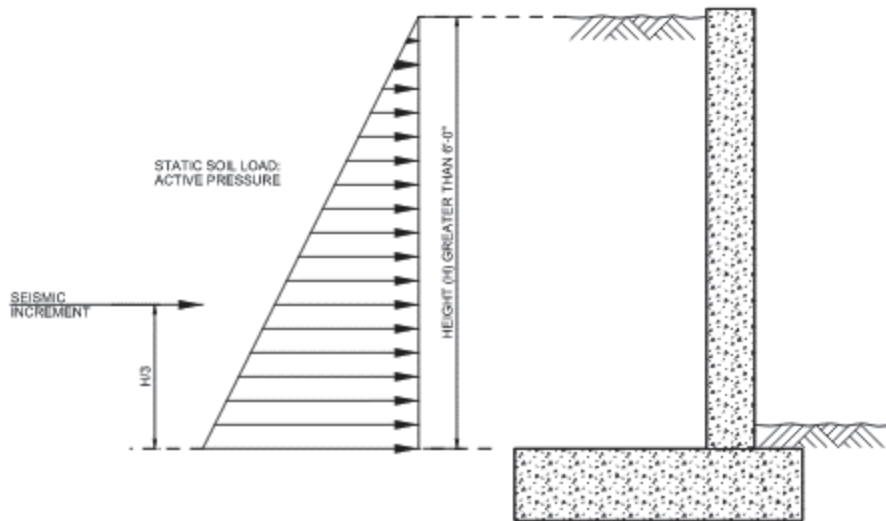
Retaining Walls with Backfill Height Greater Than 6’-0”
